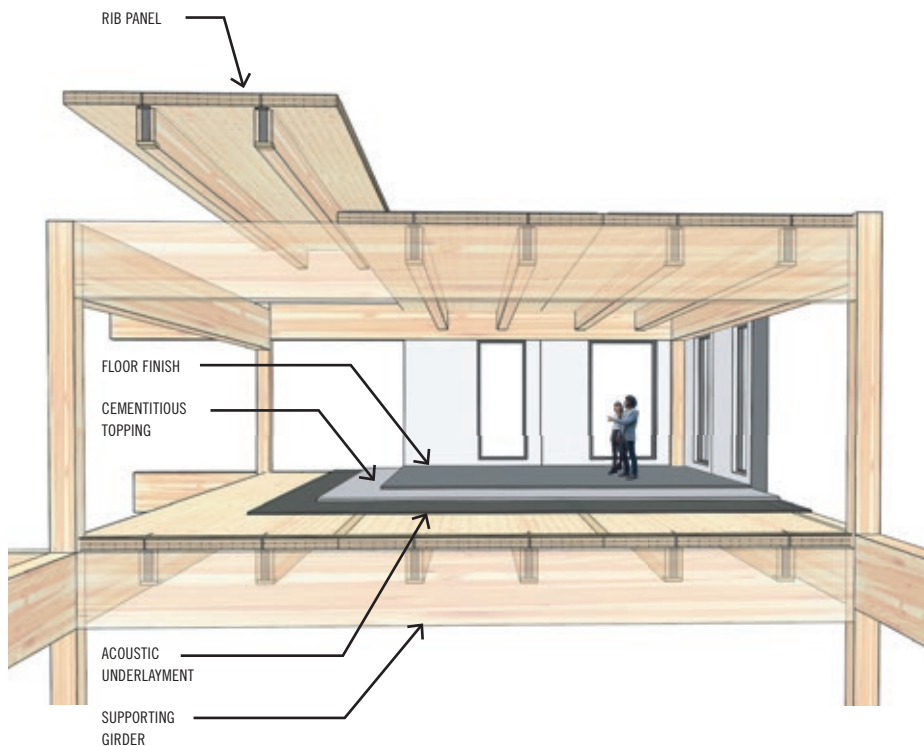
Katerra Rib Panel topping assembly for the Catalyst Building
